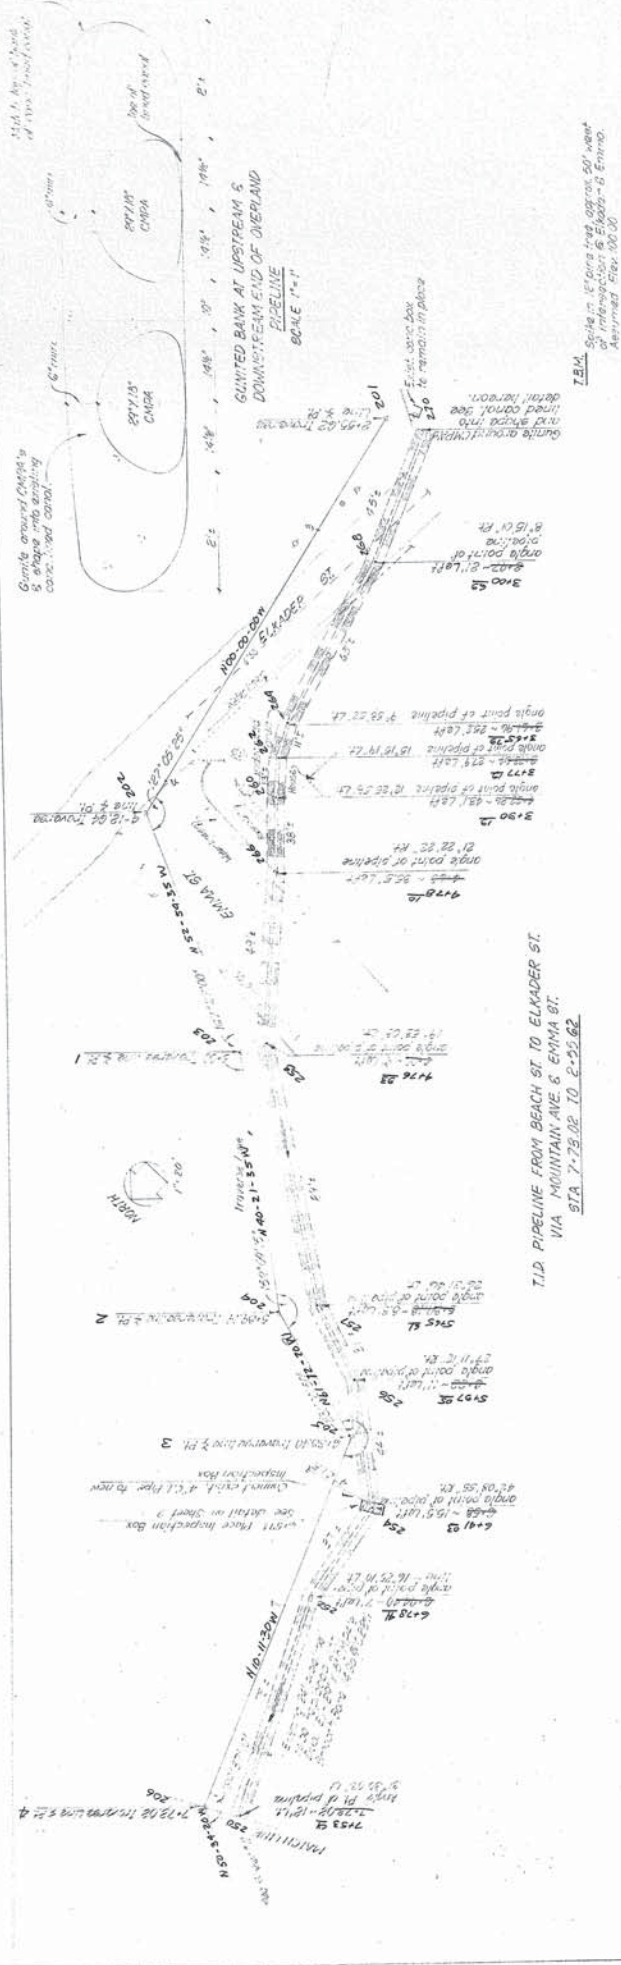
SINGLE PLAN AND CROSS SECTIONAL LINE
